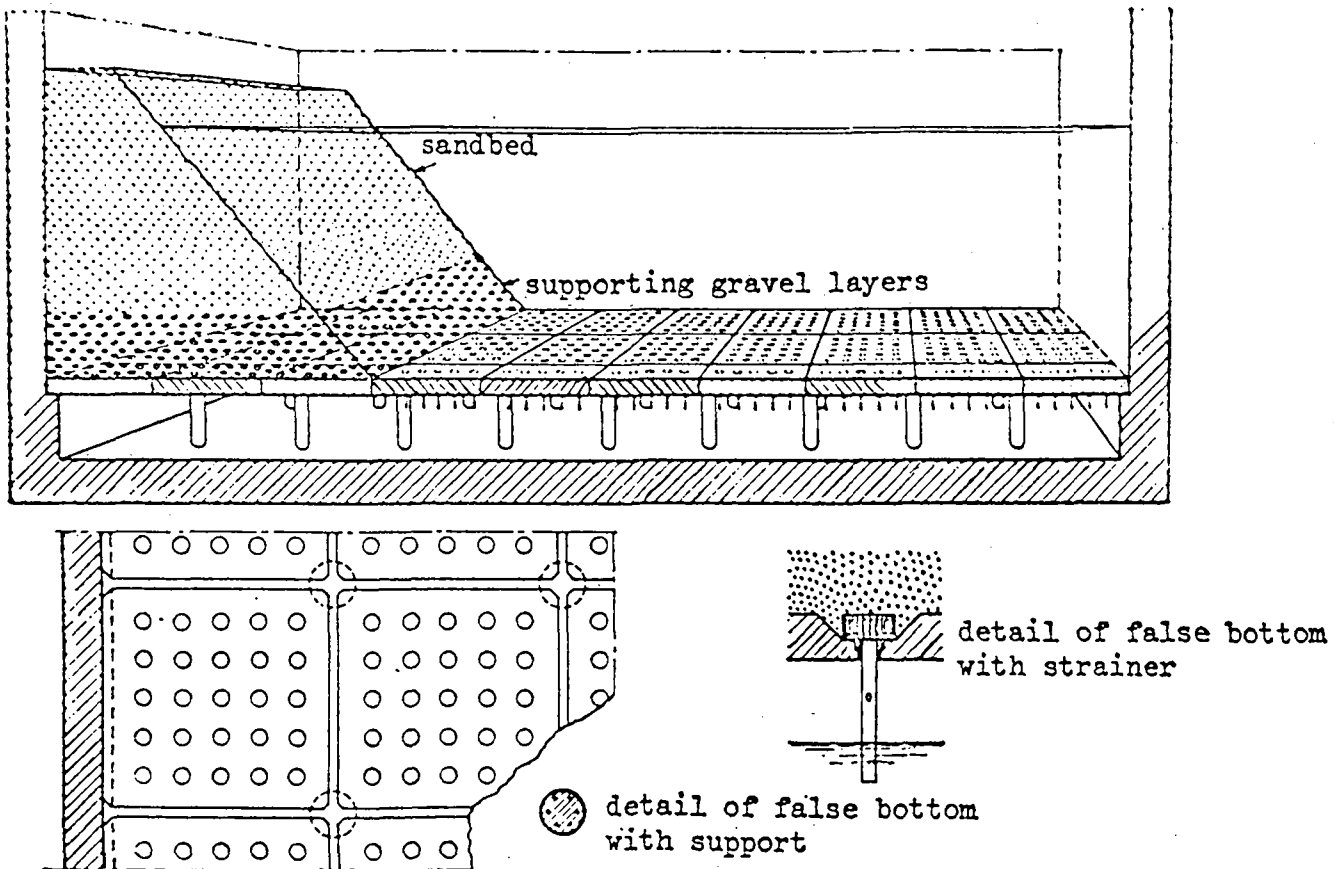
False bottom and strainer underdrainage system for backwashing with water and air.
